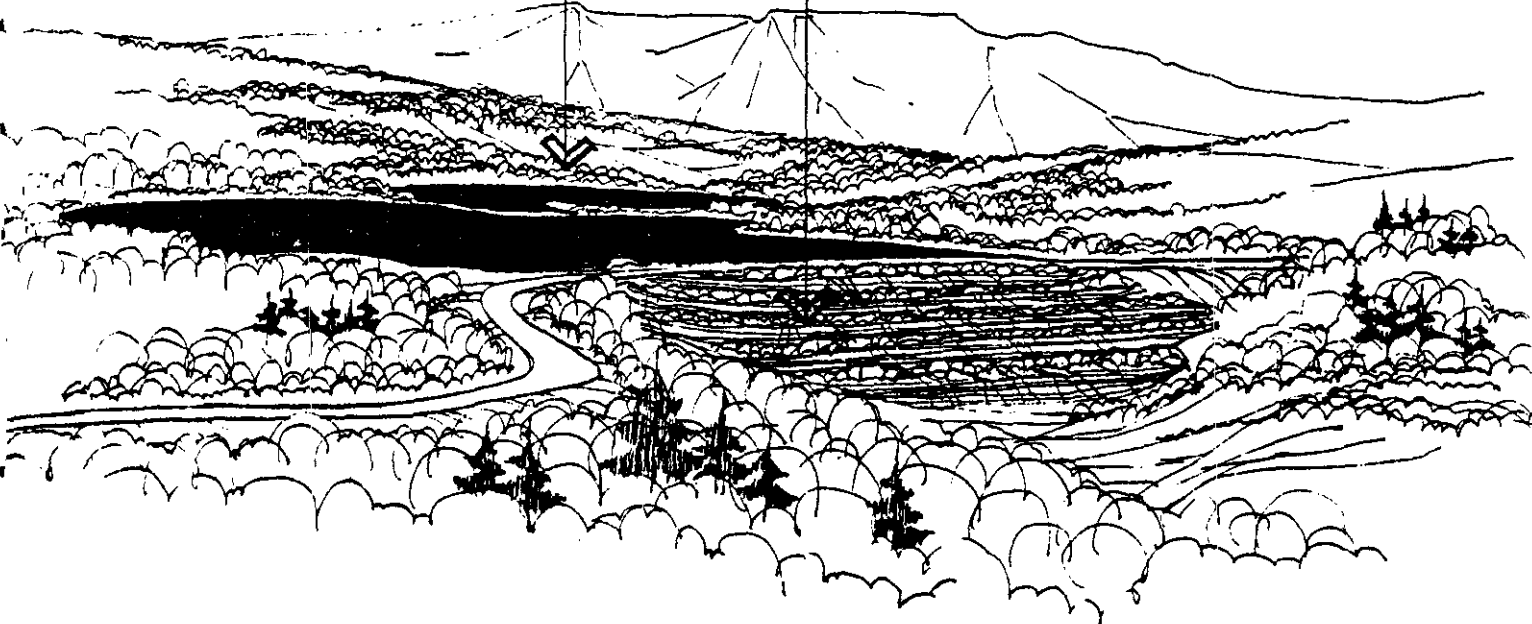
Retaining Embankment and Reservoir Alternatives
